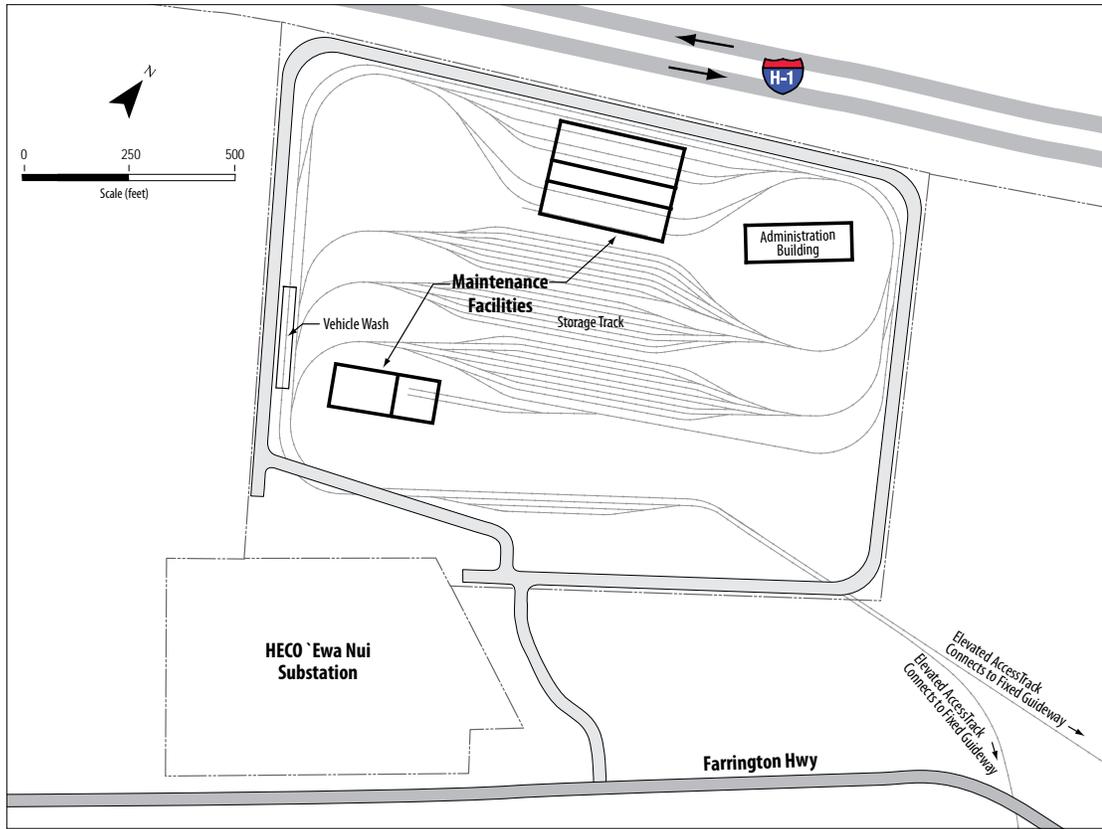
Maintenance and Storage Facility in Ho'opili Location and Conceptual Layout
